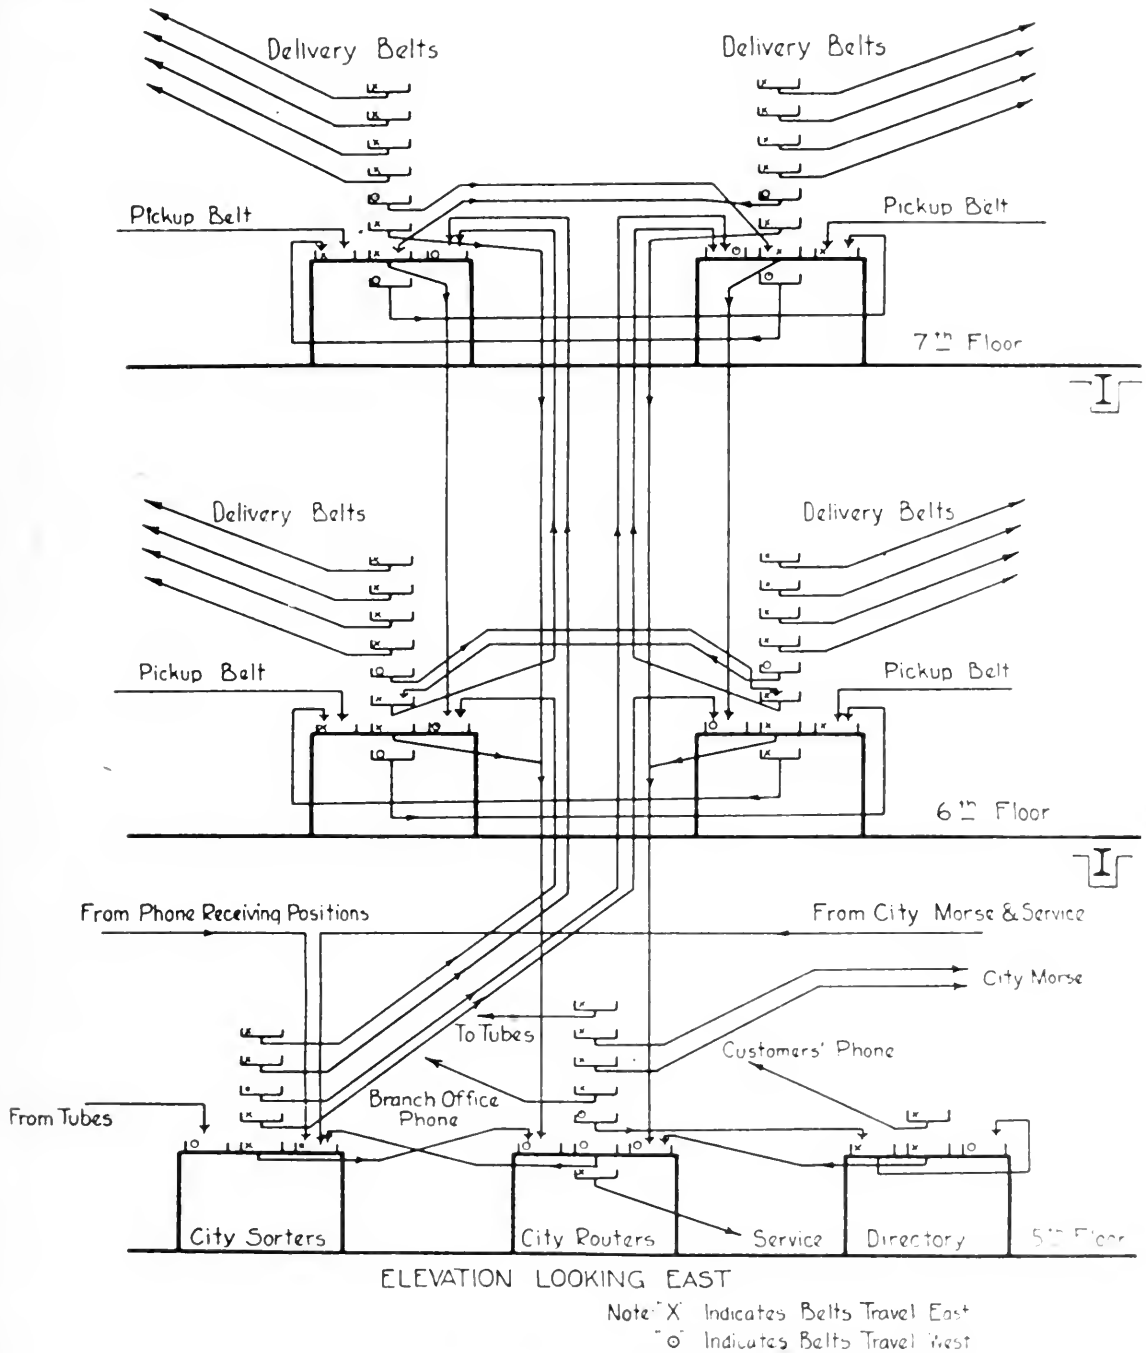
Schematic Layout of Chicago Belt Conveyors.
